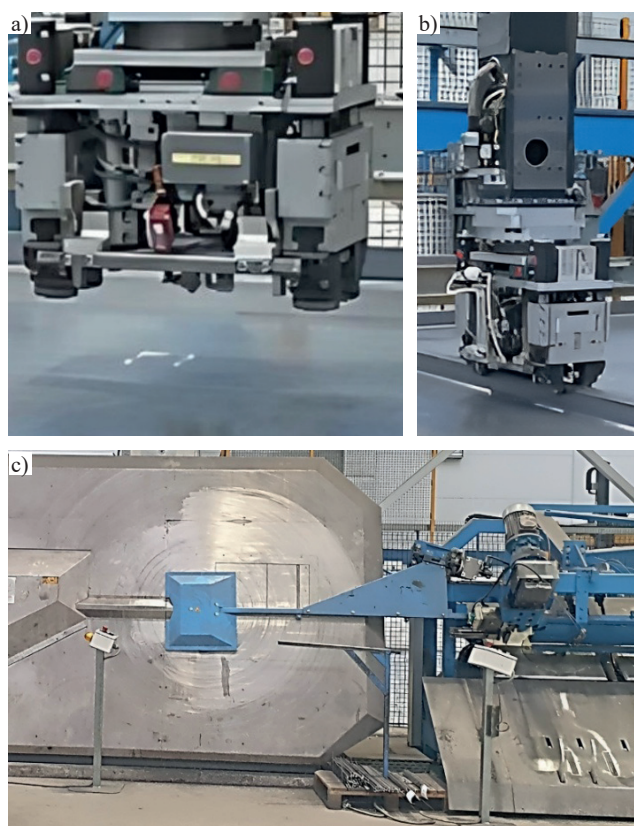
A plotter applying contours on a steel pallet formwork (a); view of the formwork robot (b) and automatic stirrup bender (c).
